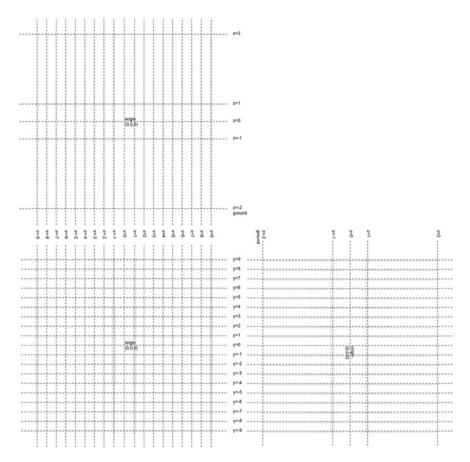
HOUSE 1, plan and elevation of the protostructure with a numeral reference system (X; Y; Z) CAD drawing. © ALICE EPFL
